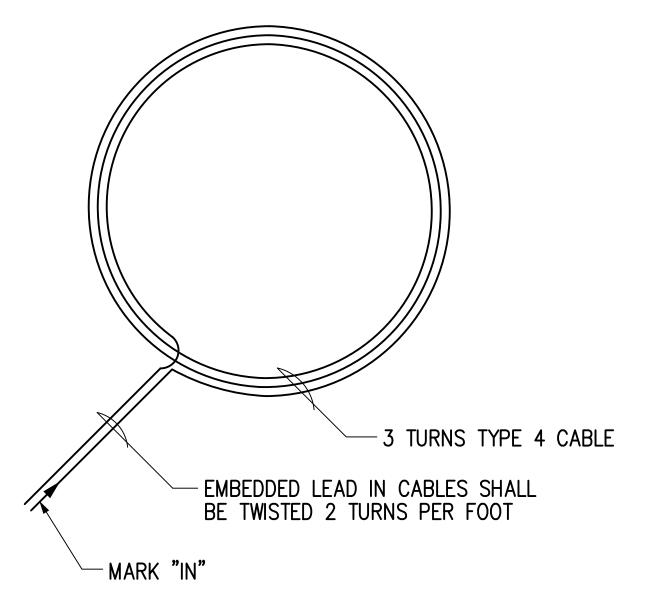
DETAIL OF DETECTOR LOOP INSTALLATION AT EDGE OF PAVEMENT
